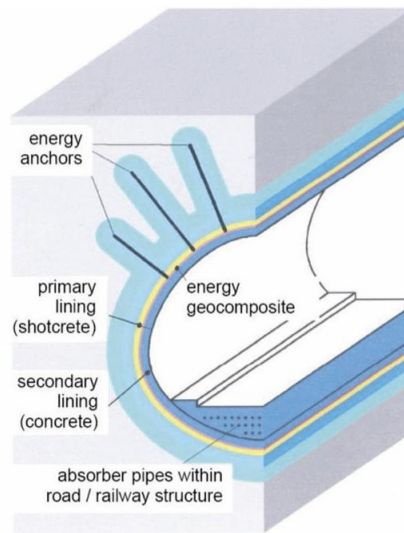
Schematic of energy anchors in a NATM tunnel (Brandl, 2016)
